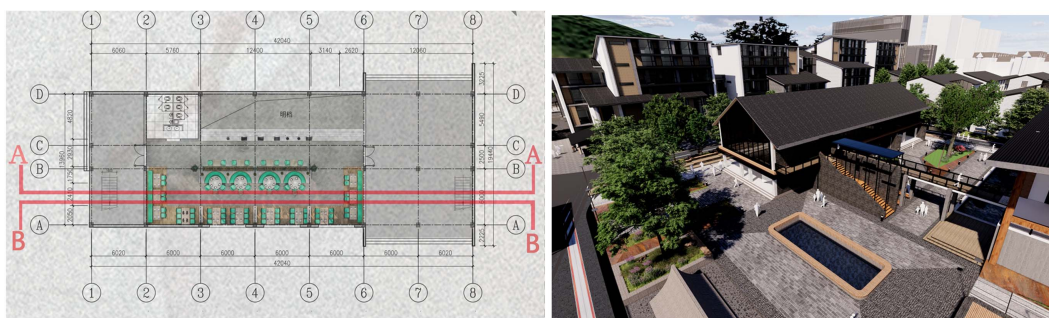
The floor plan and renovation renderings of the first floor of the light restaurant
